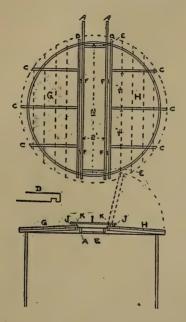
A CHEAP ROOF OF STAVE SILO.
